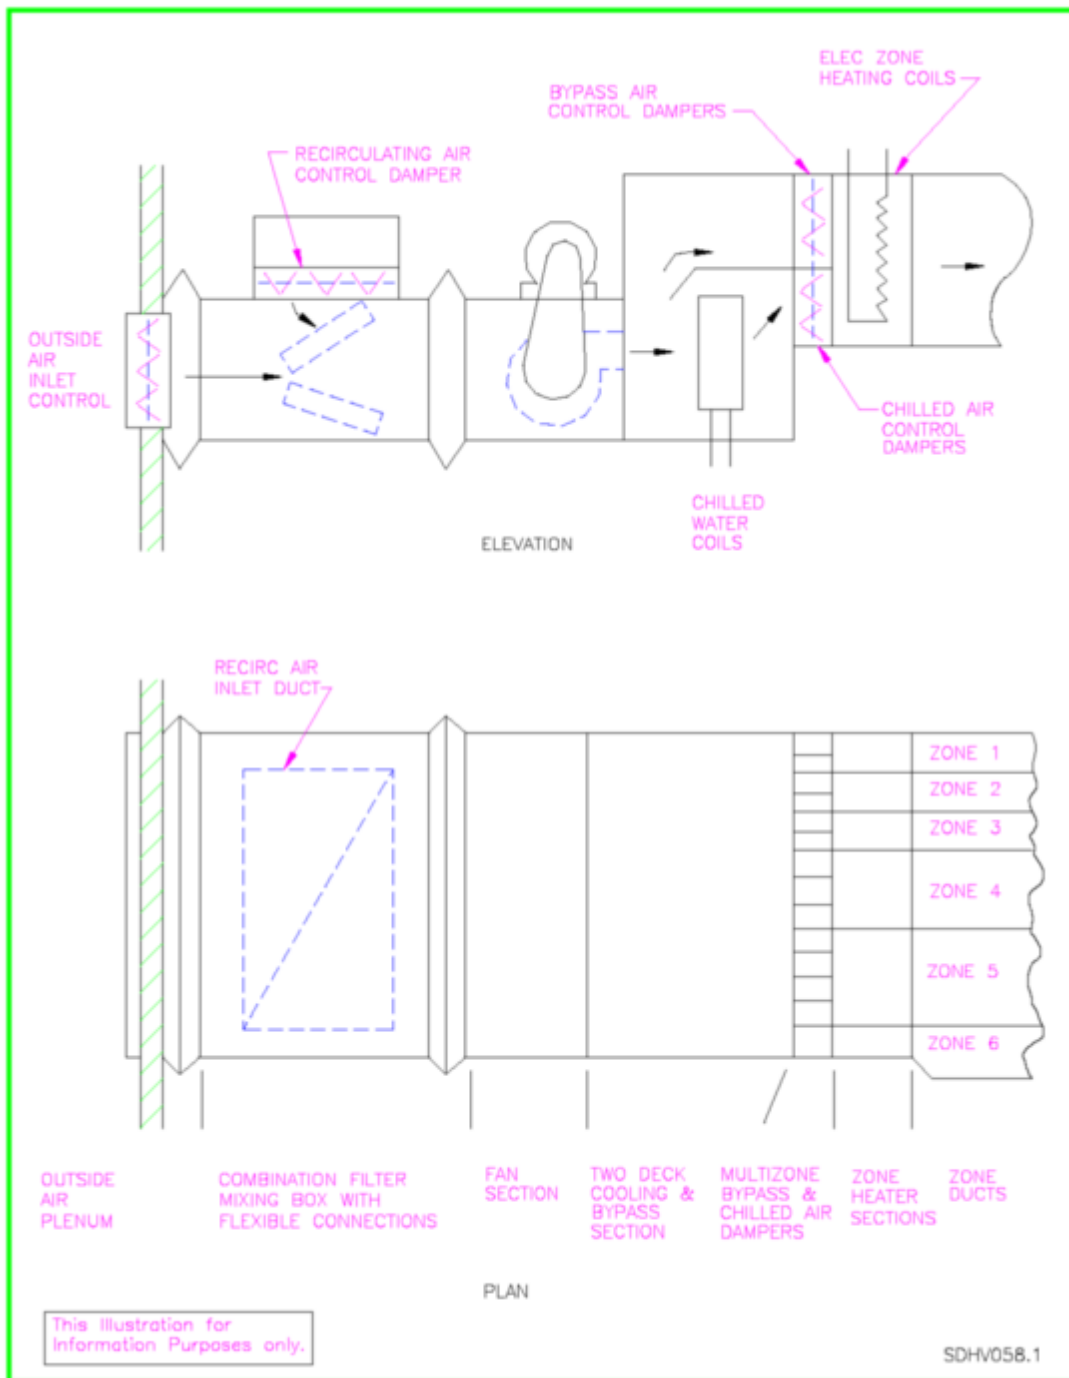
Air Handling Unit Plan and Elevation
